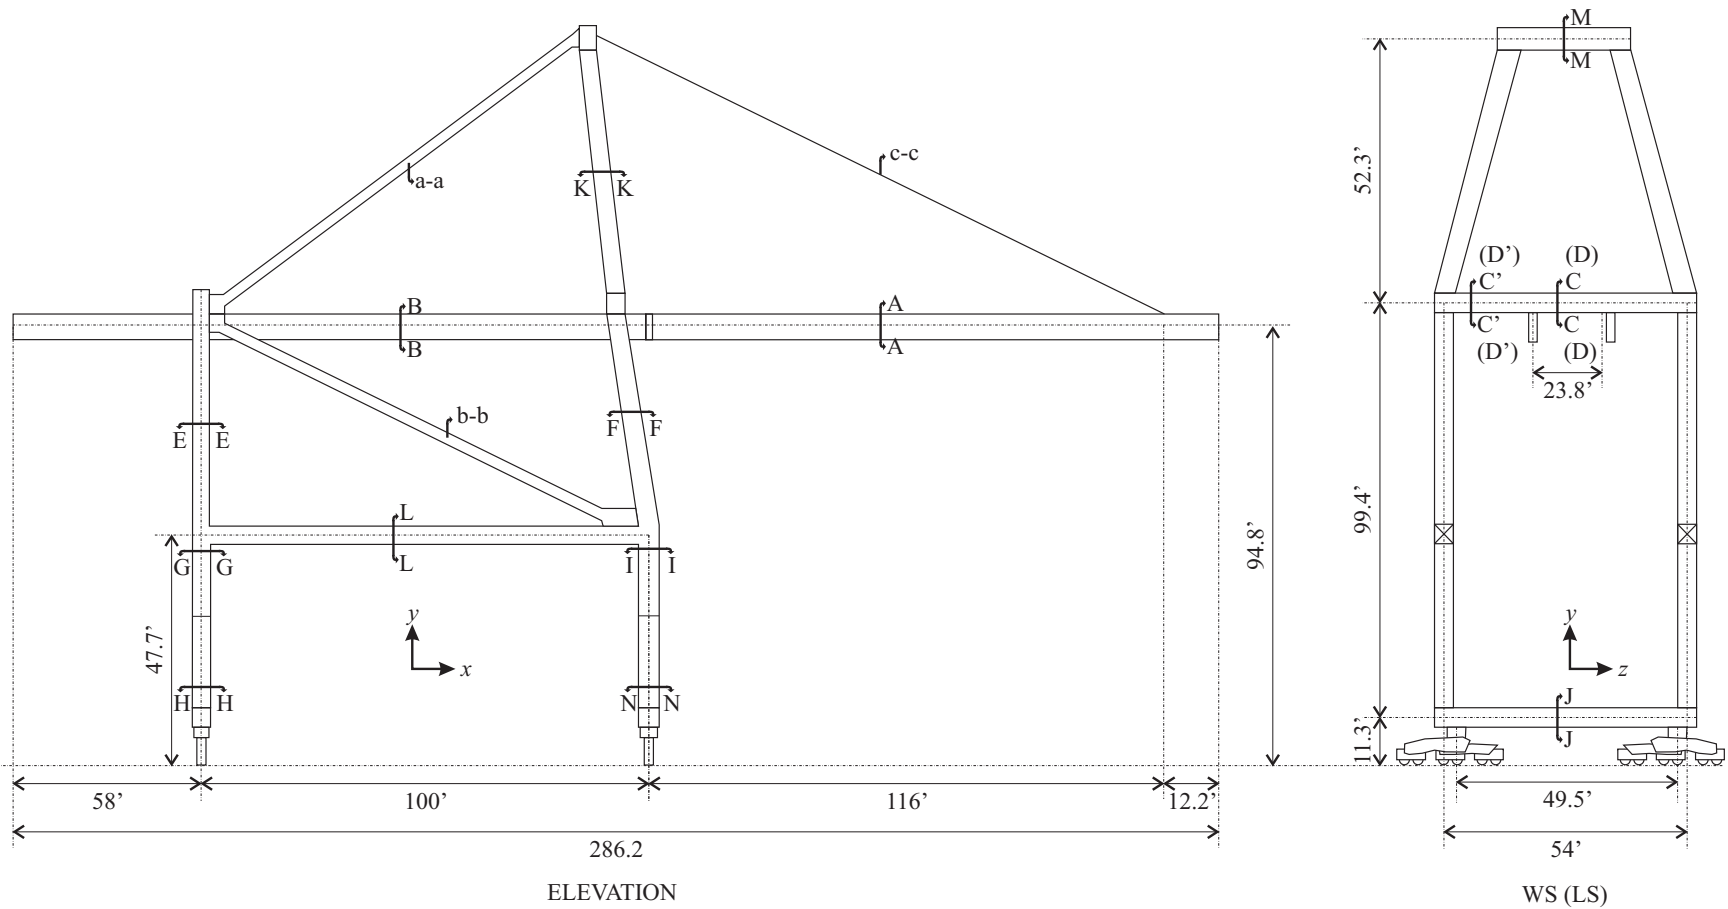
Overall dimensions and section assignments (defined in Tables A.8-9) of LD100 container crane.
